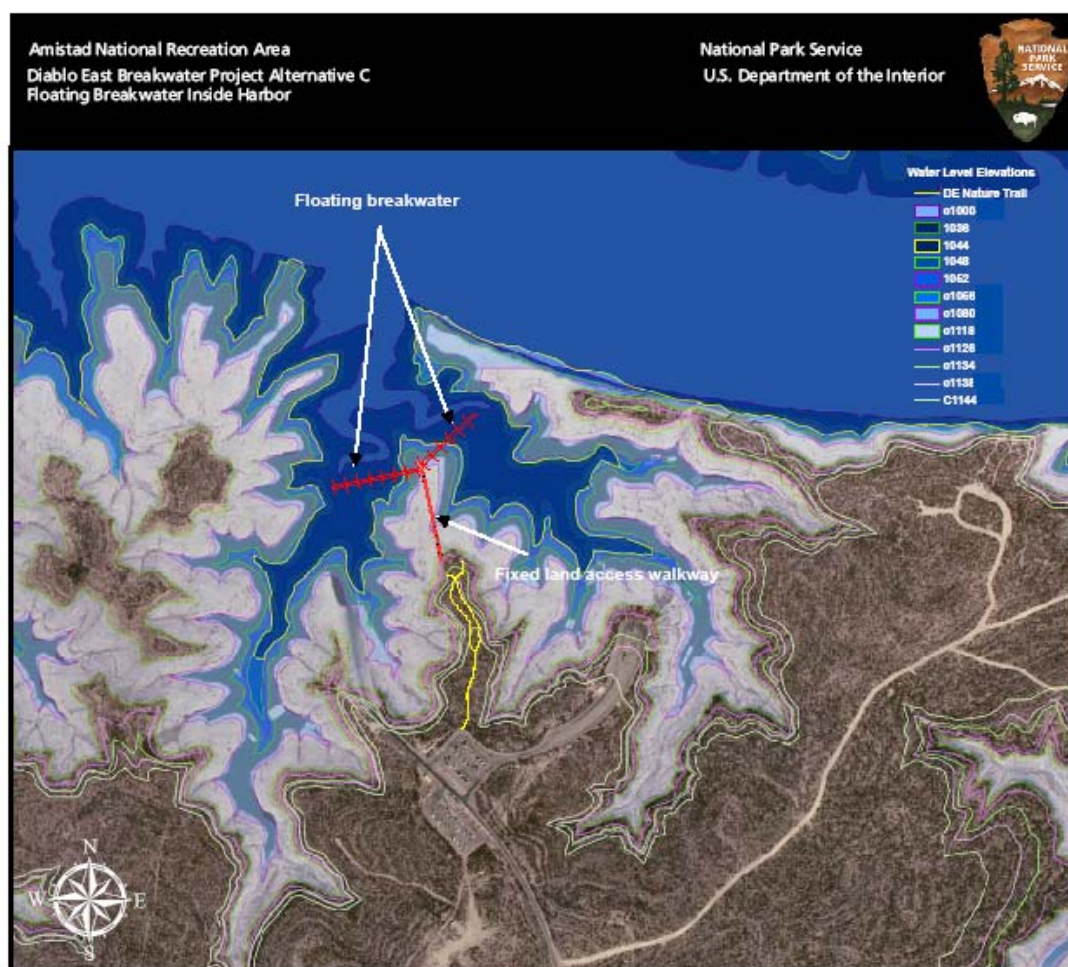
Alternative C showing the proposed location of a floating breakwater.
